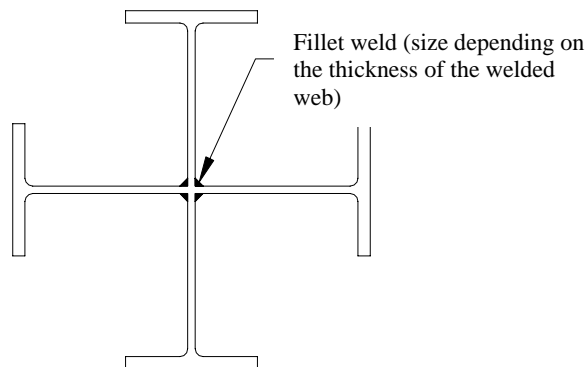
Typical Drawing for Cruciform Column Using Universal Beam Section (CCUB 686x254x340)
